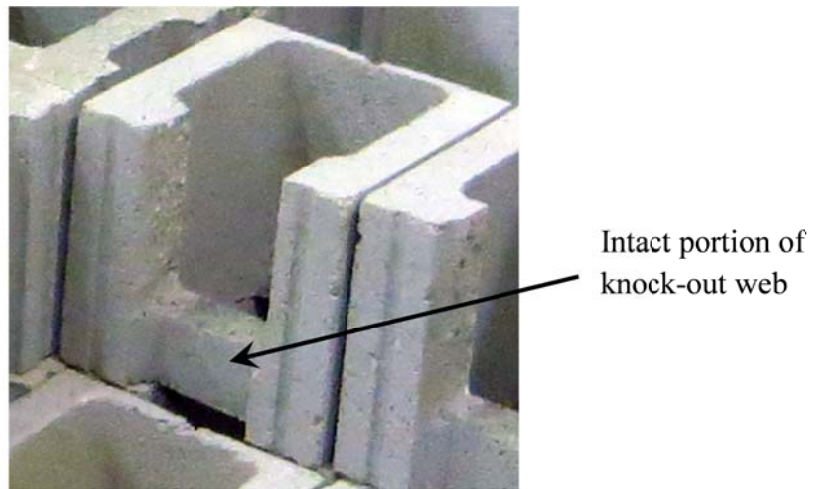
Intact Portion of Knock-out Web on Half Block to Facilitate Construction.
